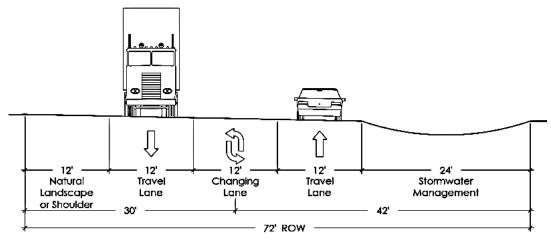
Davis Road (looking north) Cross Section Adjacent to CLIBP
